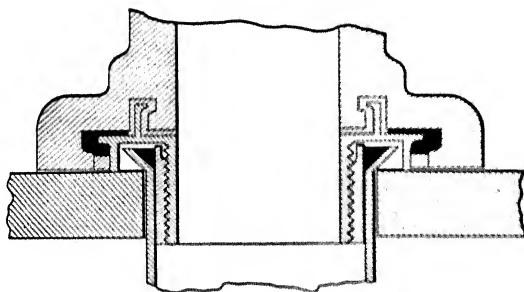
Section of Mott's Improved Form of Floor Connection.
